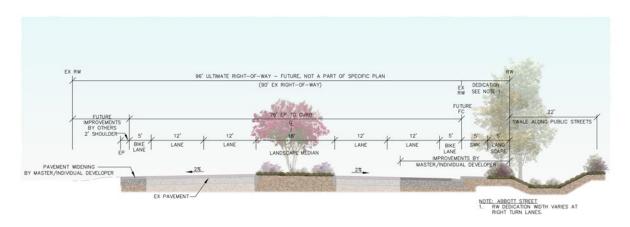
Proposed Harris Road, Southwest of Harris Place (no parking allowed) Modified 4/1/2024
